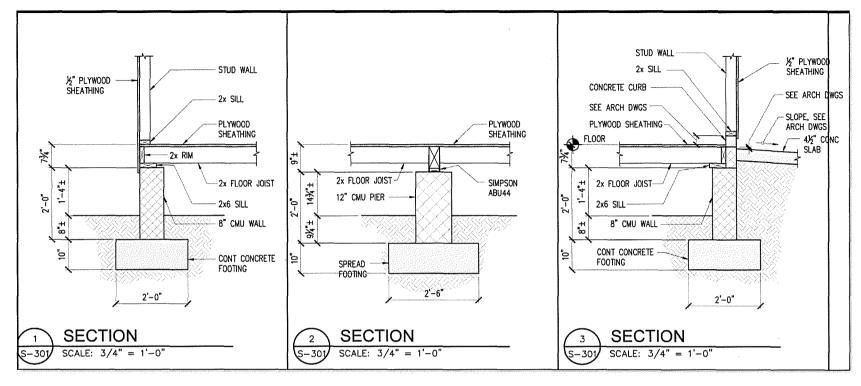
Depths of pier and CMU wall footings in relation to the current ground surface (cross-sections courtesy of Fung Associates, Inc.).
